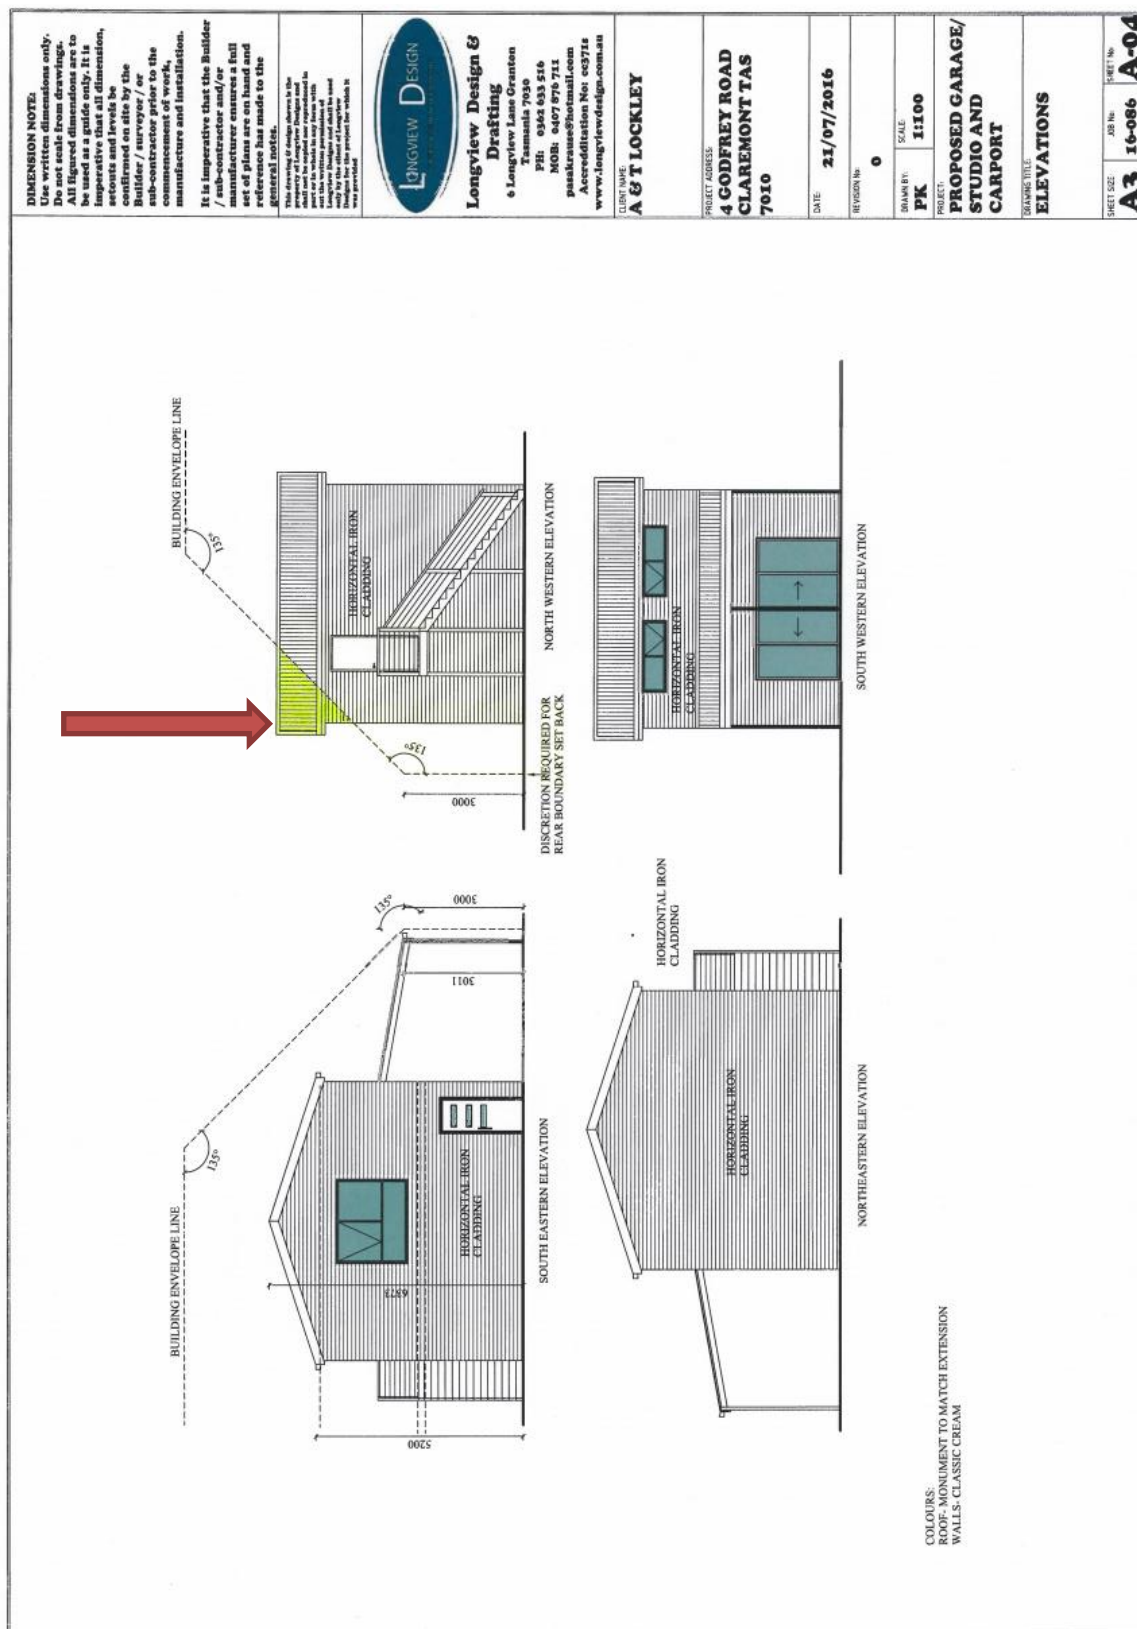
Elevations Showing Proposal in Relation to Building Envelope Acceptable Solution.
